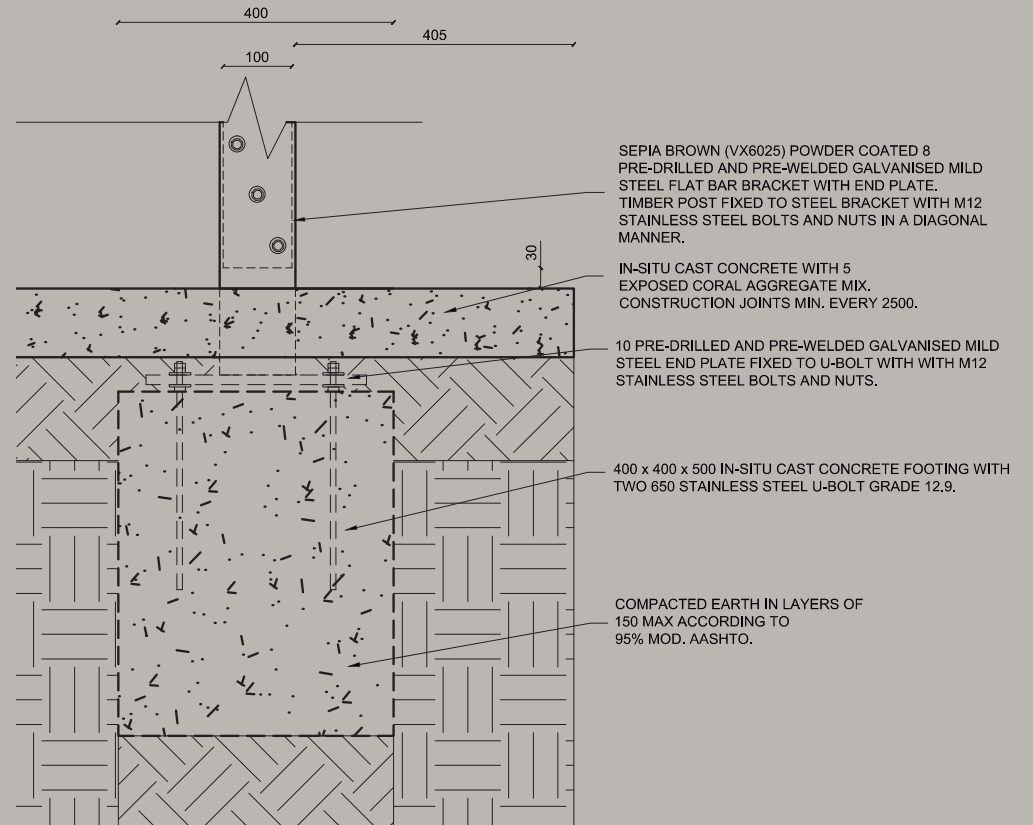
Detail Section (1:10) of Typical Timber Post Fixing Detail (Author, 2014).
